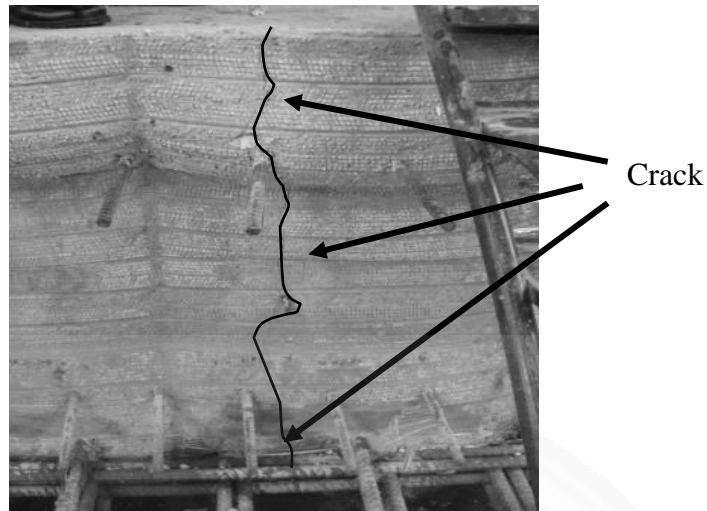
Crack on side surface of a mass concrete footing
